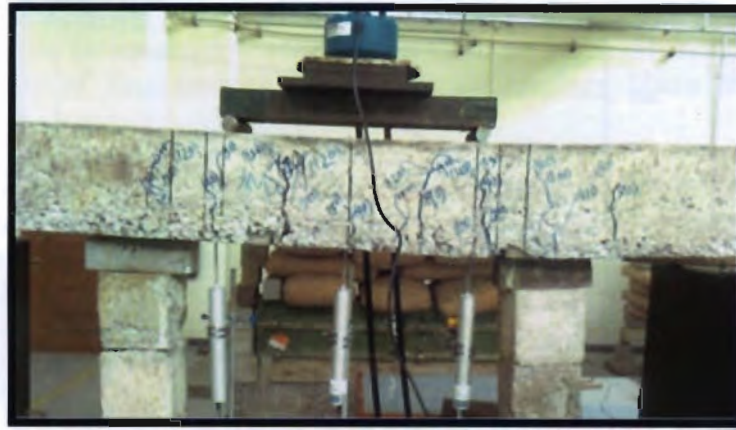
Loading and Instrumentation of Typical Test Beam for Flexural Test
